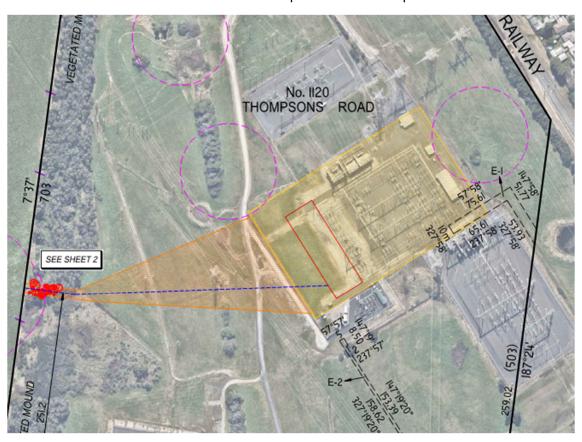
From Cable Site Plan, indicative cable route envelope shown in orange, terminal connection works to be located within red rectangle
